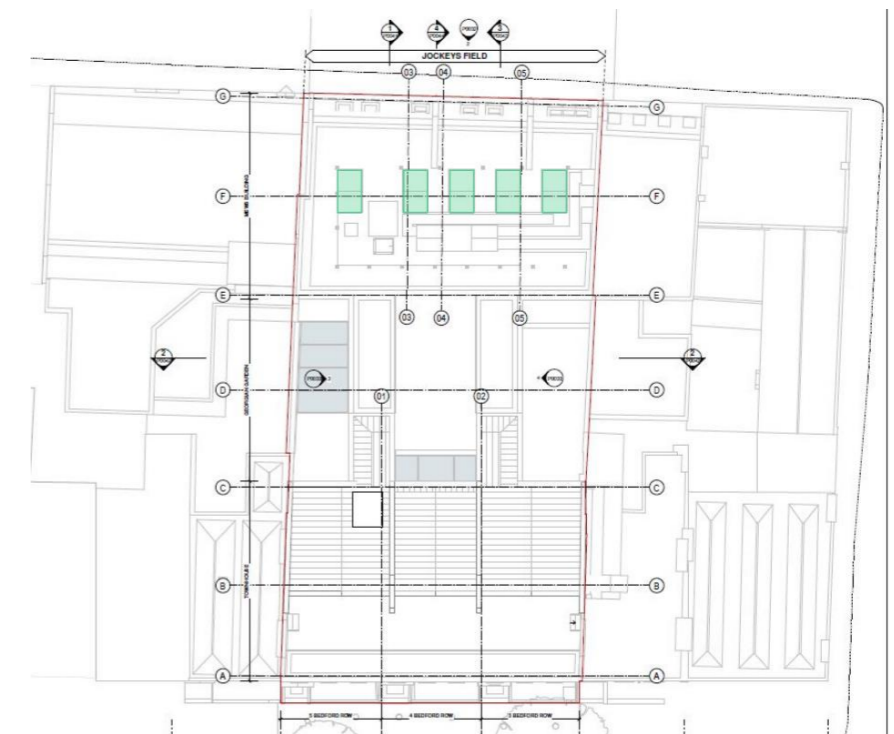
Roof Plan indicating possible location for PV Panels (red).
